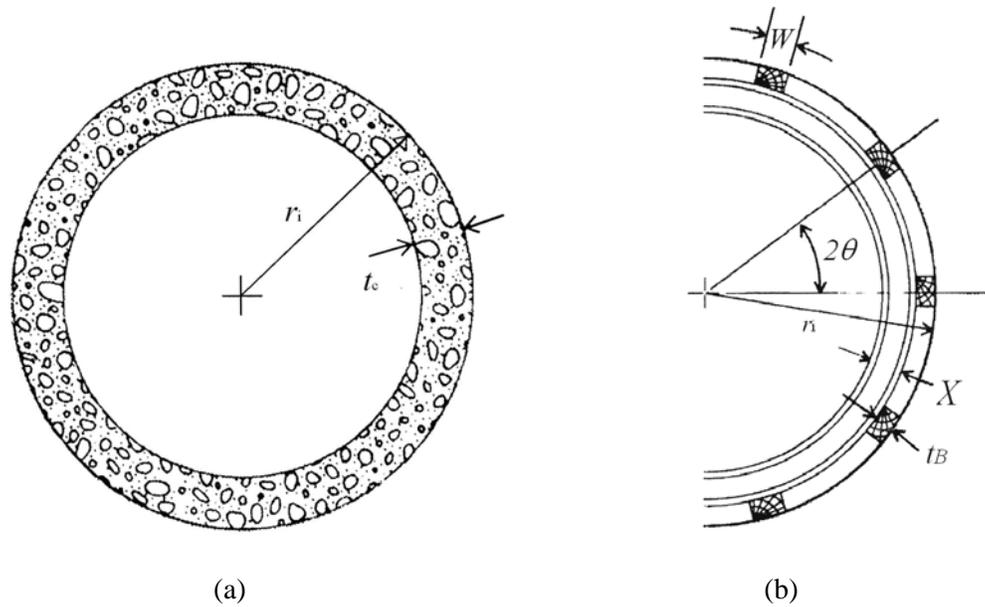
Support Systems: (a) Concrete / Shotcrete Lining, (b) Blocked Steel Set
